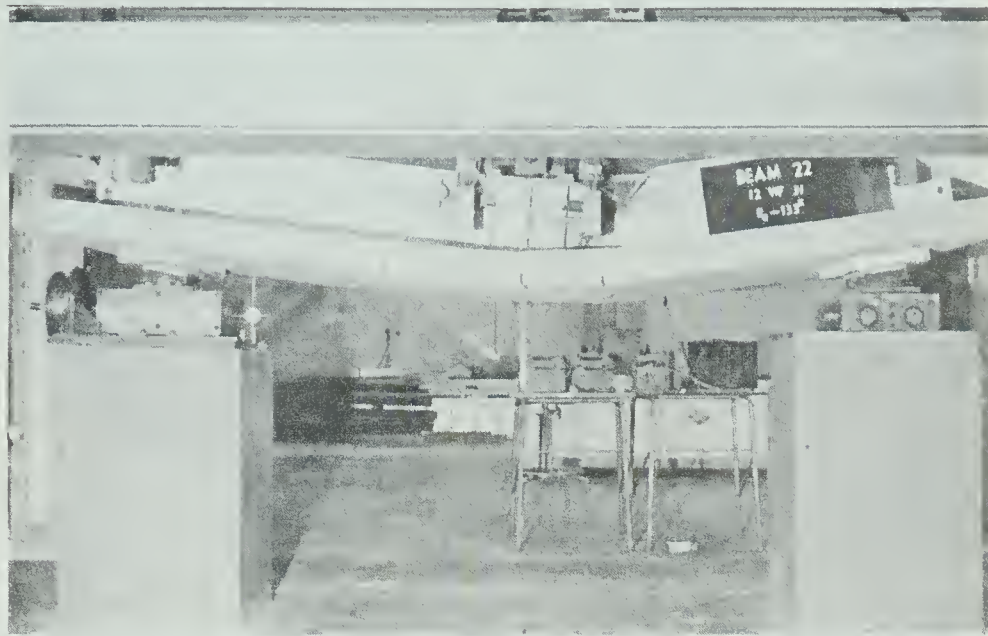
TYPICAL APPEARANCE AT FAILURE
